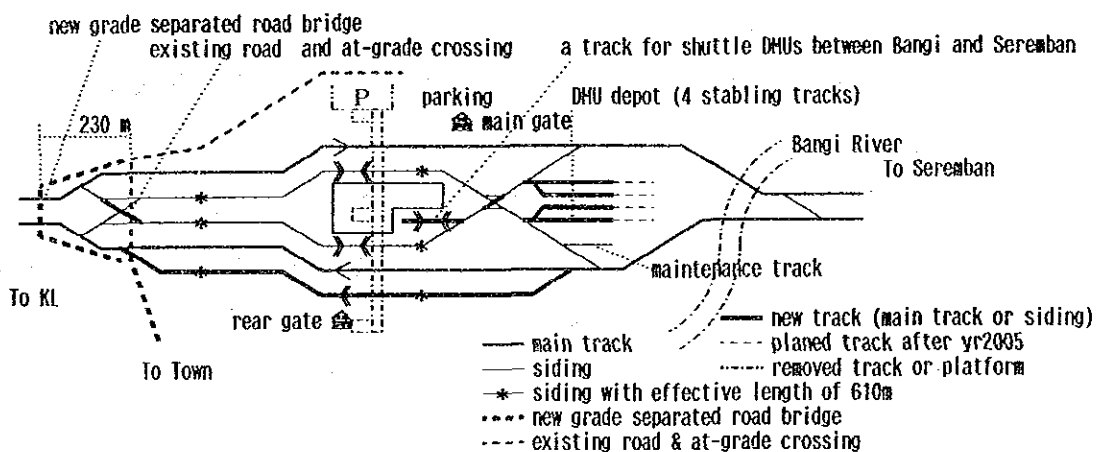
Track Layout of Bangi Station in RBCS
